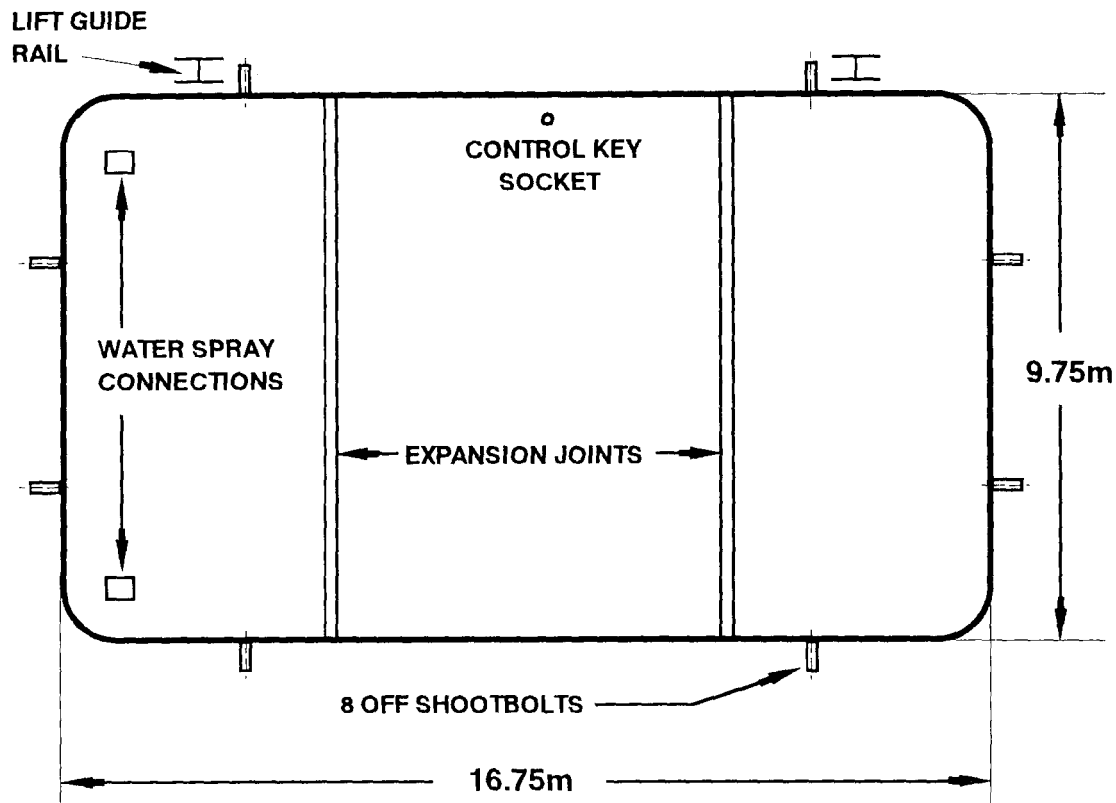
PLAN VIEW OF LIFT PLATFORM
